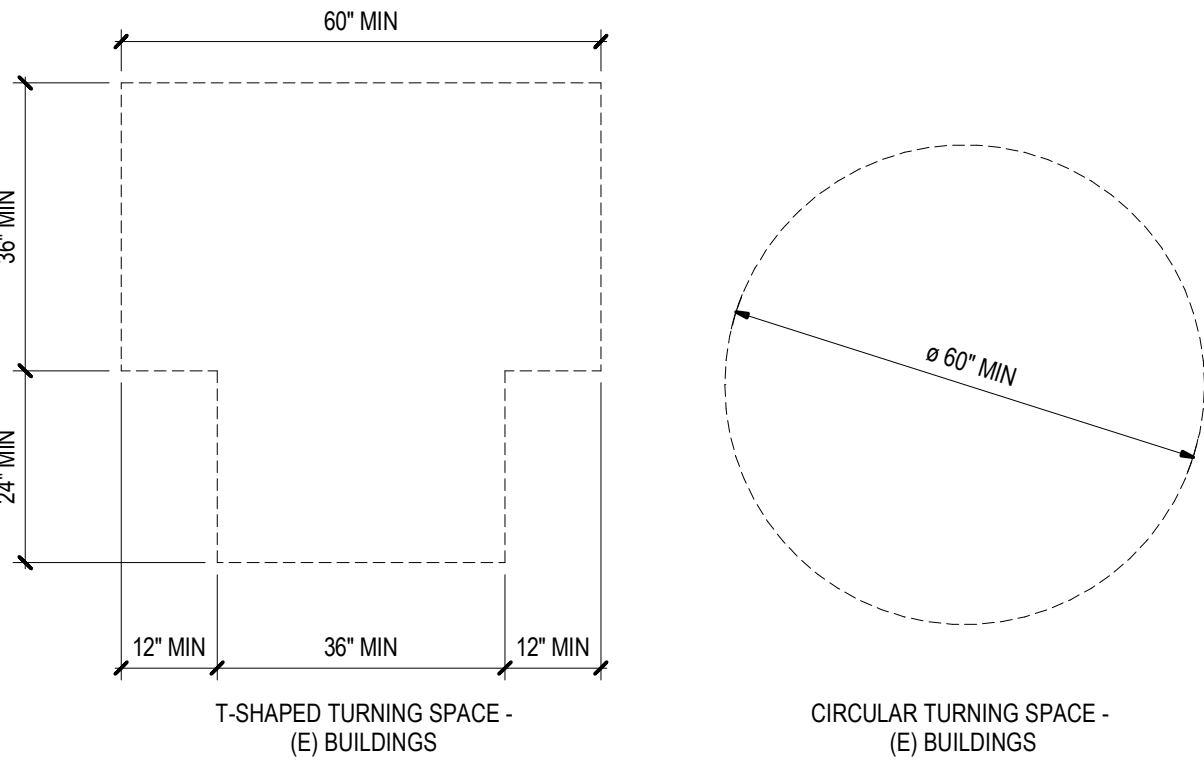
DETAILS - DOORS, DOORWAY APPROACH & TURNS
